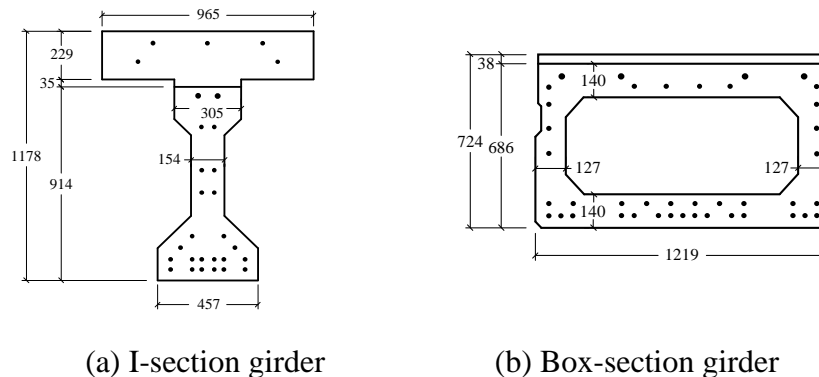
Cross-sectional geometry of girders (dimensions in mm)
